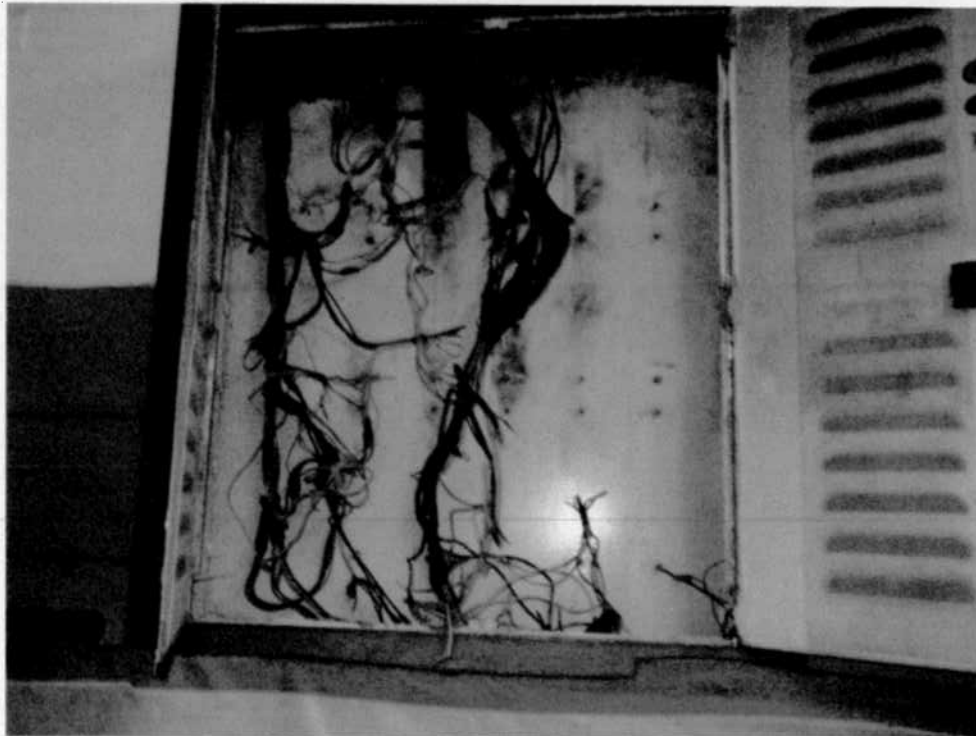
Ballast cabinet outside of Room 213 (all ballasts have been removed).
